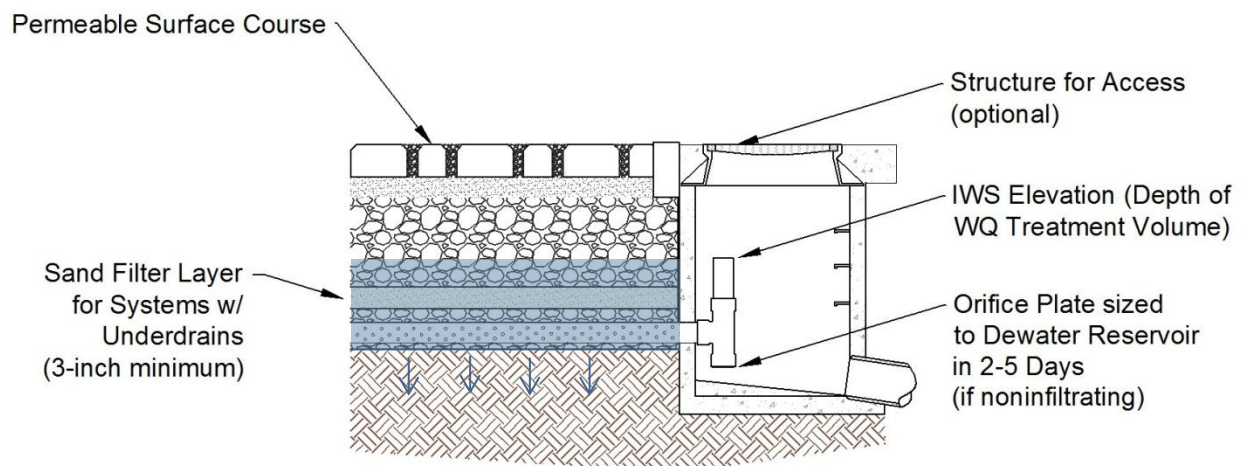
Configuration 2 – Infiltration permeable pavement with upturned underdrain.
